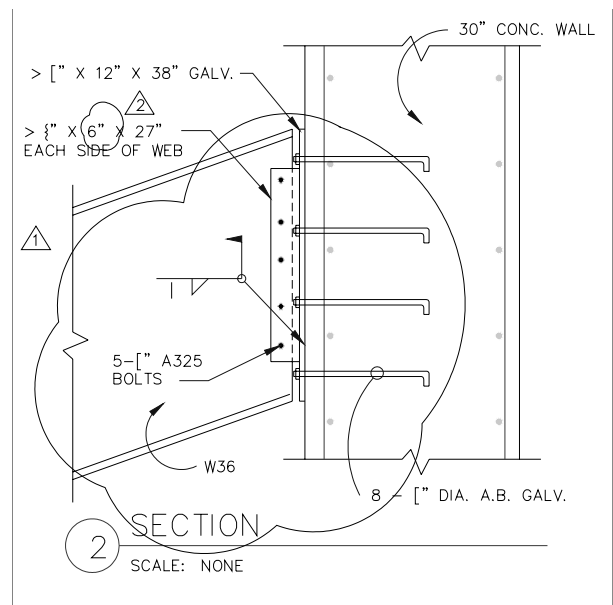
CONSERVATORY ROOF CONNECTION (EMC)
